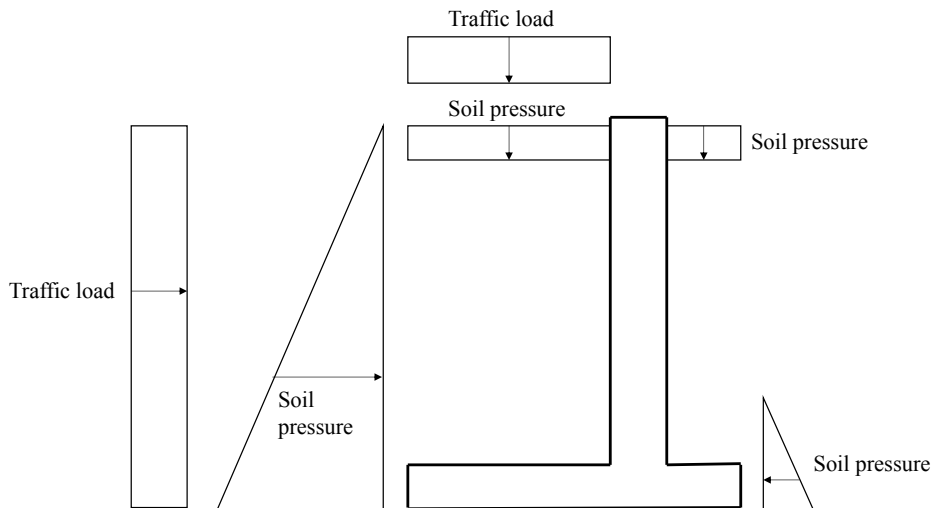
Schematic sketch over the loads acting on the retaining wall.
